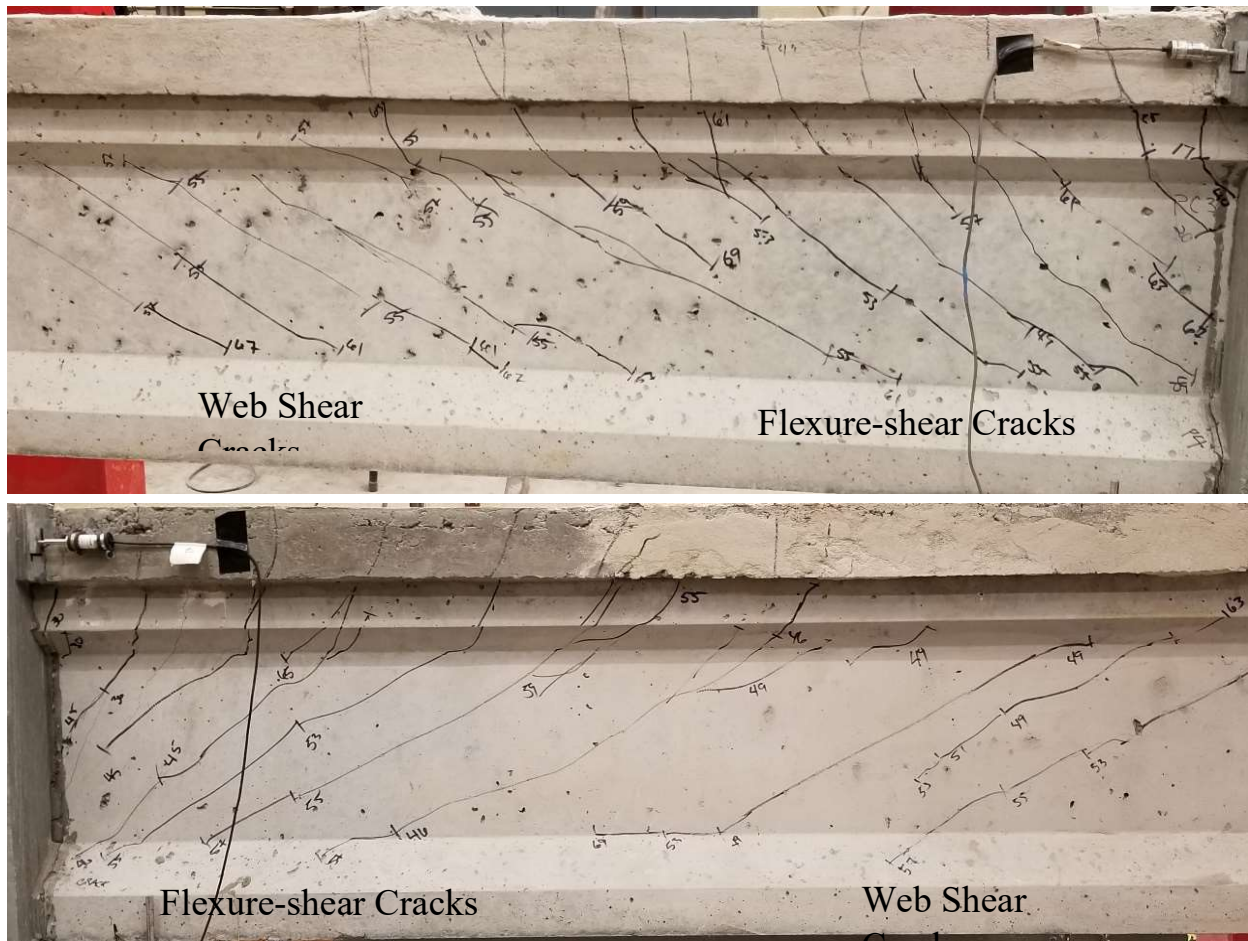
RC3-N girder with flexure-shear cracks and web shear cracks (top) and RC3-S girder with flexure-shear cracks and web shear cracks (bottom).
